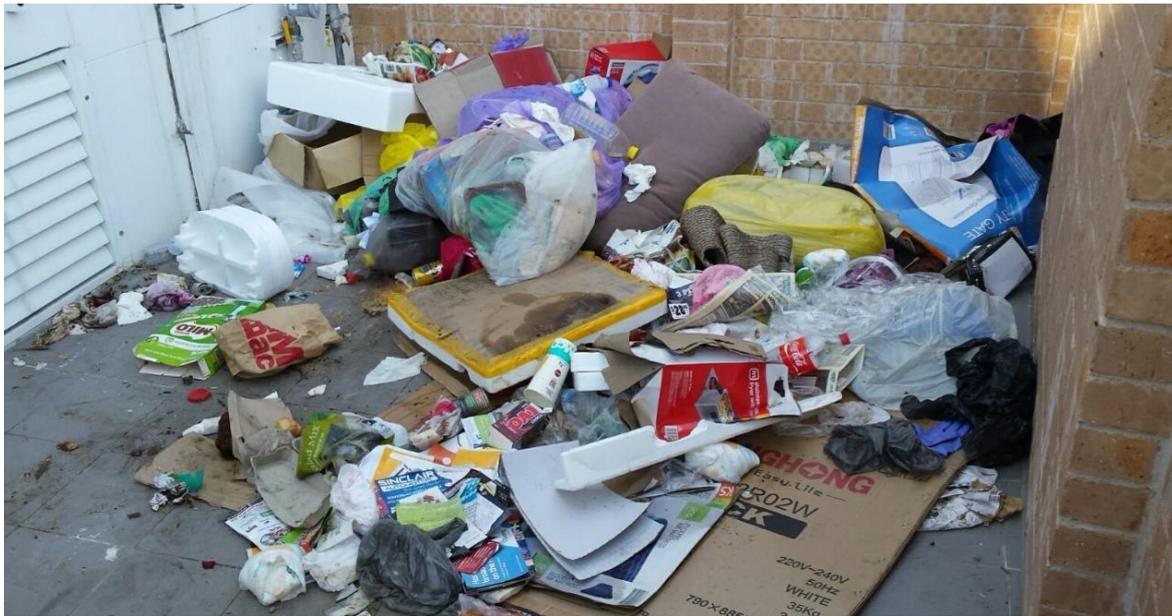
Inadequate waste storage due to bin bay not being built to requirements (overflow waste).
